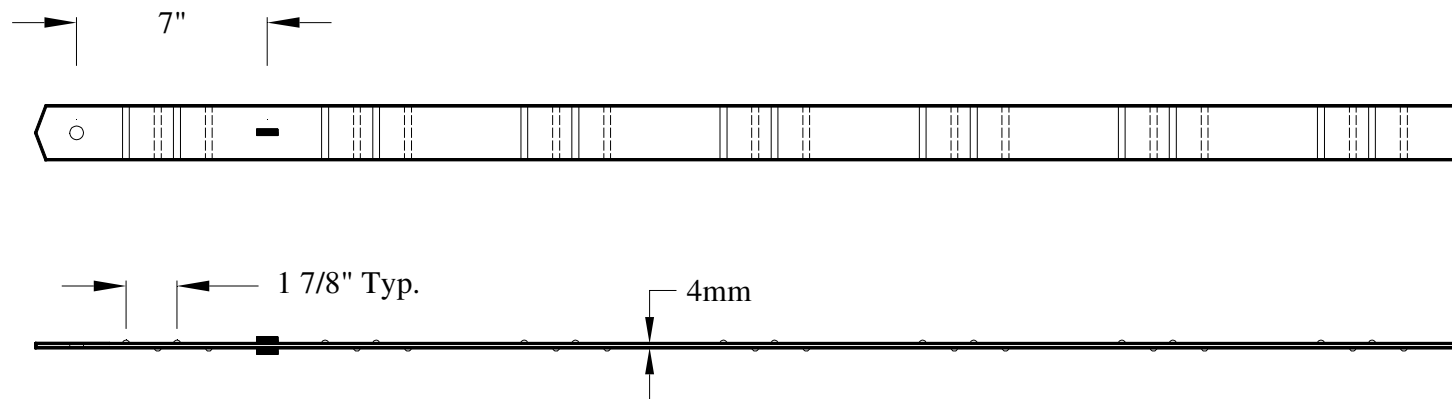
Location of Steel Strain Gages on Steel Reinforcement Strips
